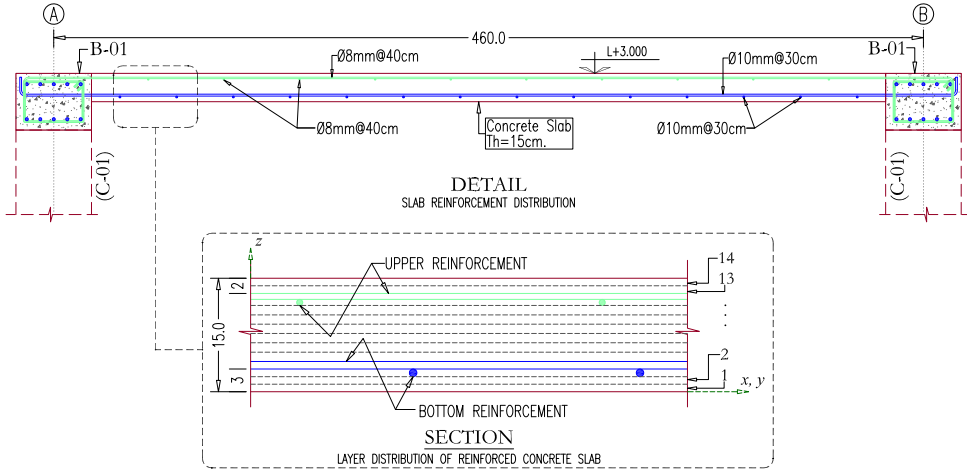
Structural drawings (detailed sections of slab) of a typical one-storey construction.
